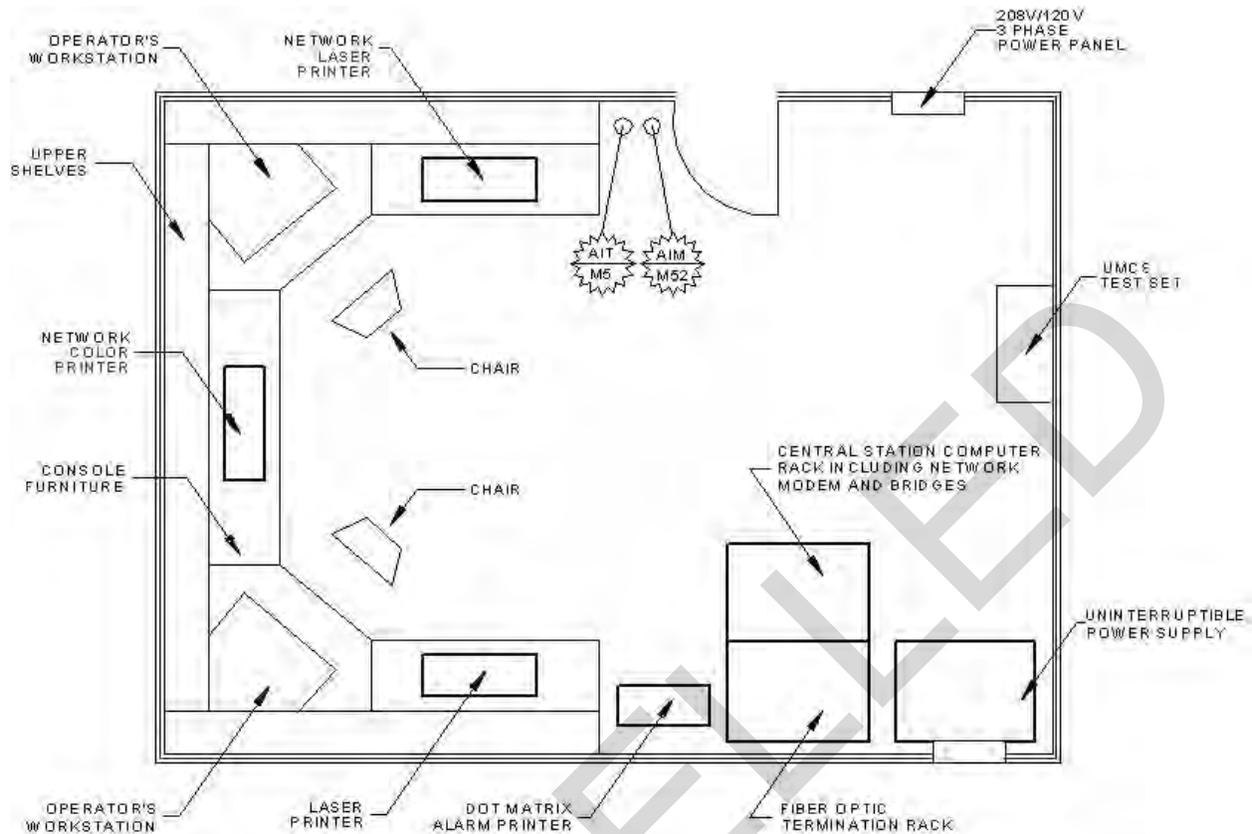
Typical Central Station or Island Station Equipment Room.
